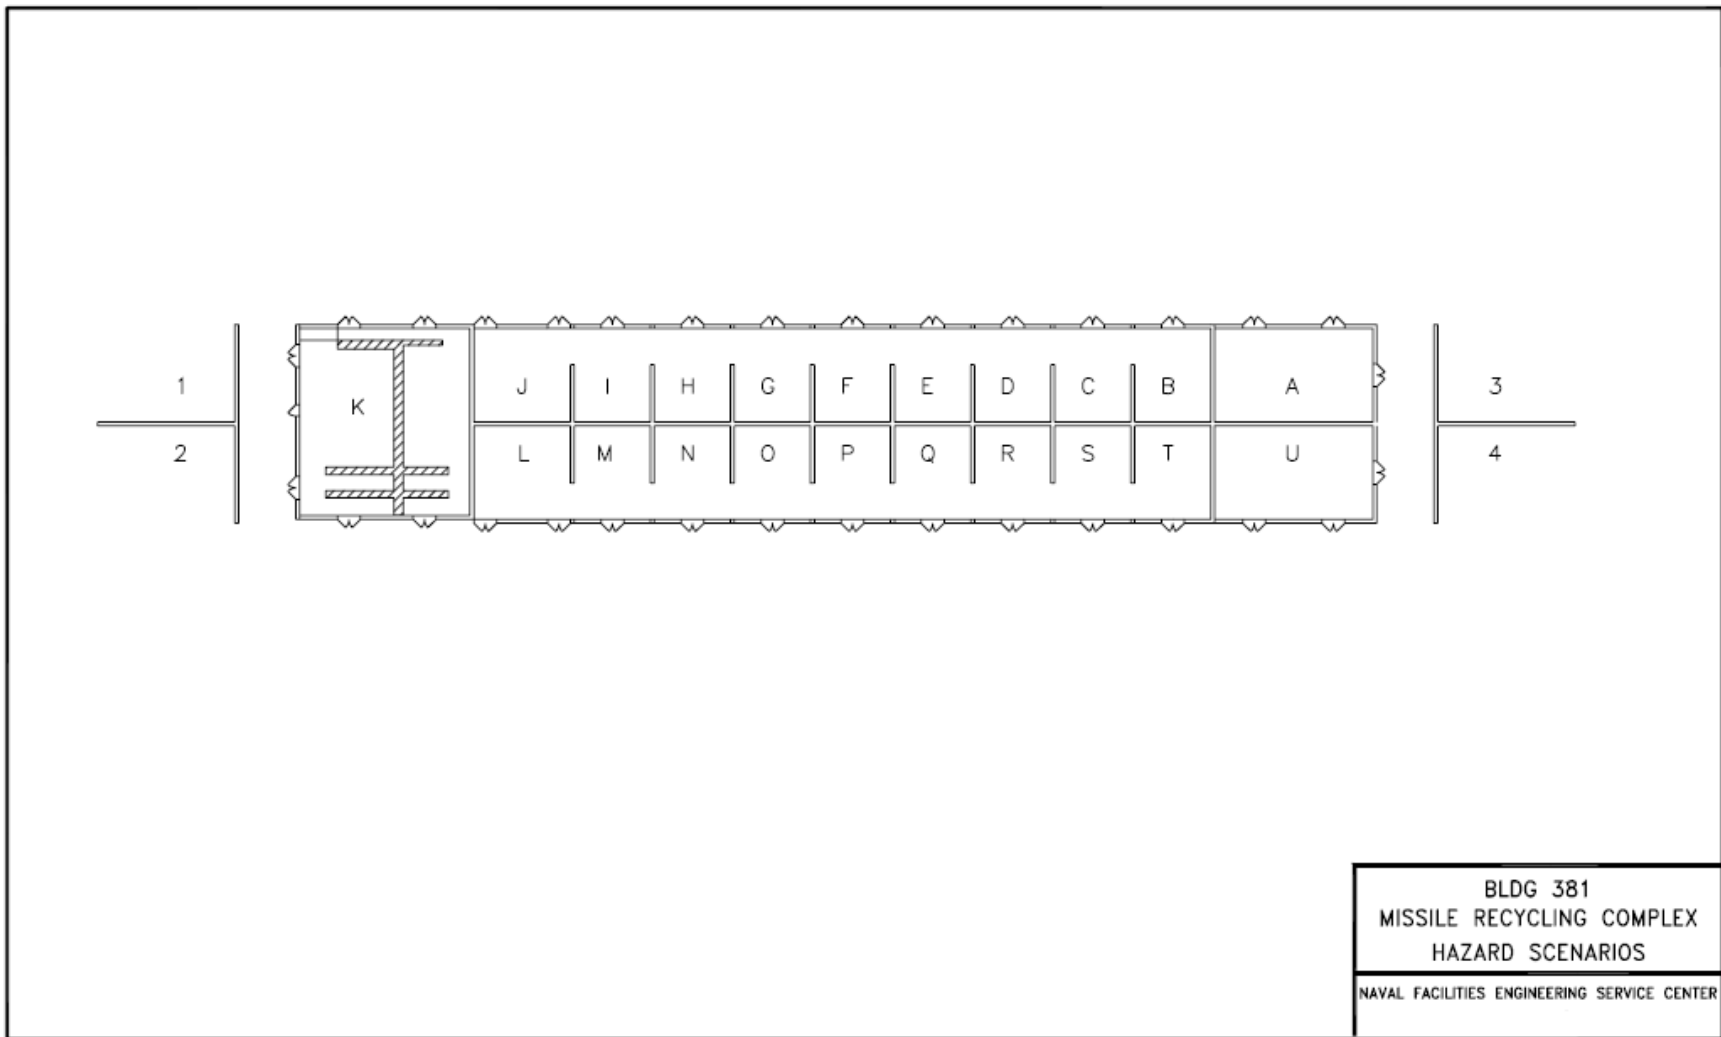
Plan view of Building 381 Missile Recycling Complex (MRC), Anniston Ammunition Depot.
